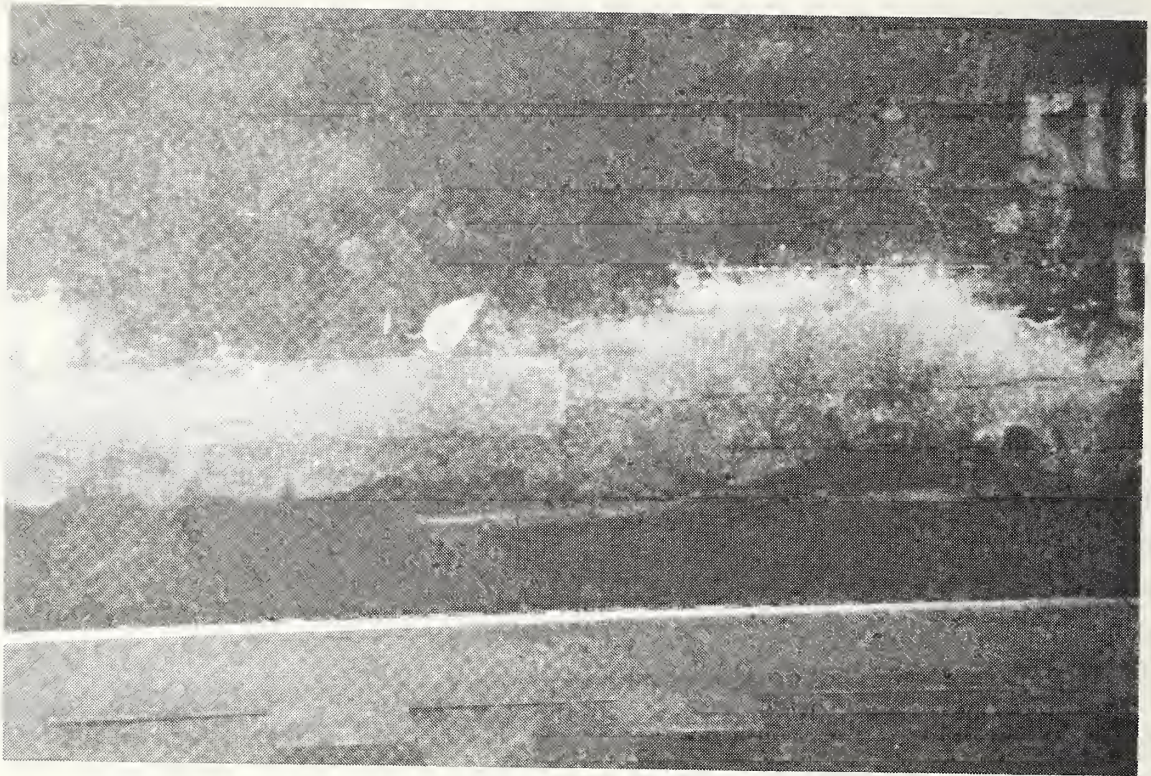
CALCIFICATION AROUND A SHRINKAGE CRACK (RED LINE, SOUTH STATION)
